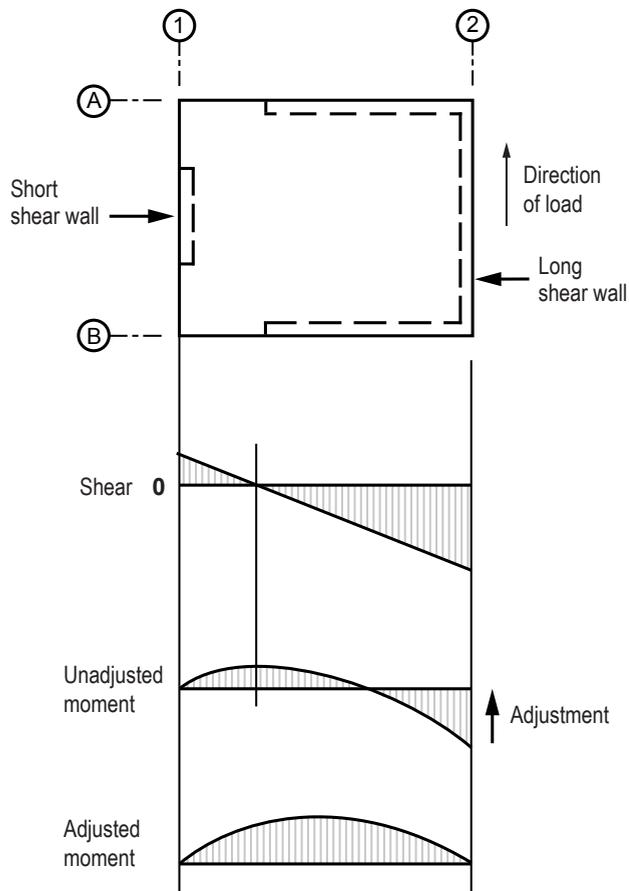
Plan view of a rigid diaphragm supported on shear walls of differing stiffness.
